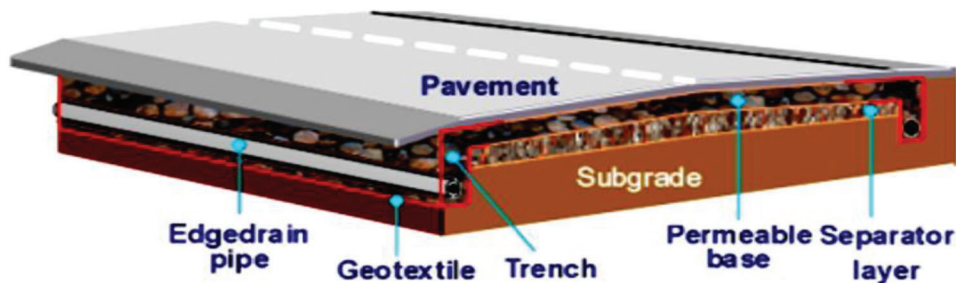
Typical asphalt pavement section with drainage layer in the DRIP program (NCHRP, 2004).
